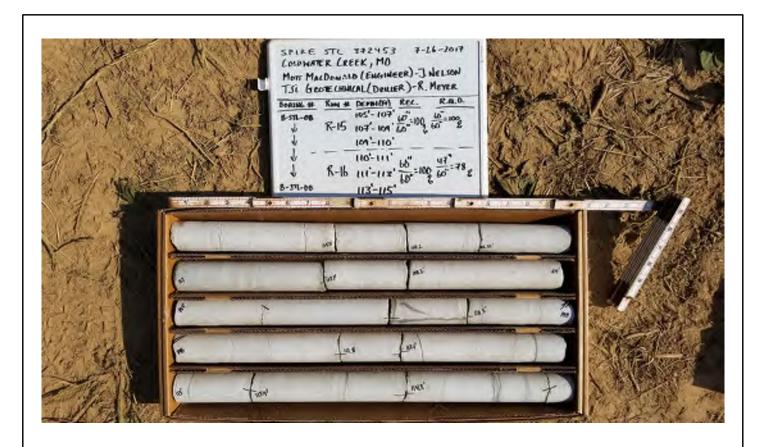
B-STL-8 Box 8 Runs 15-16 Dry
